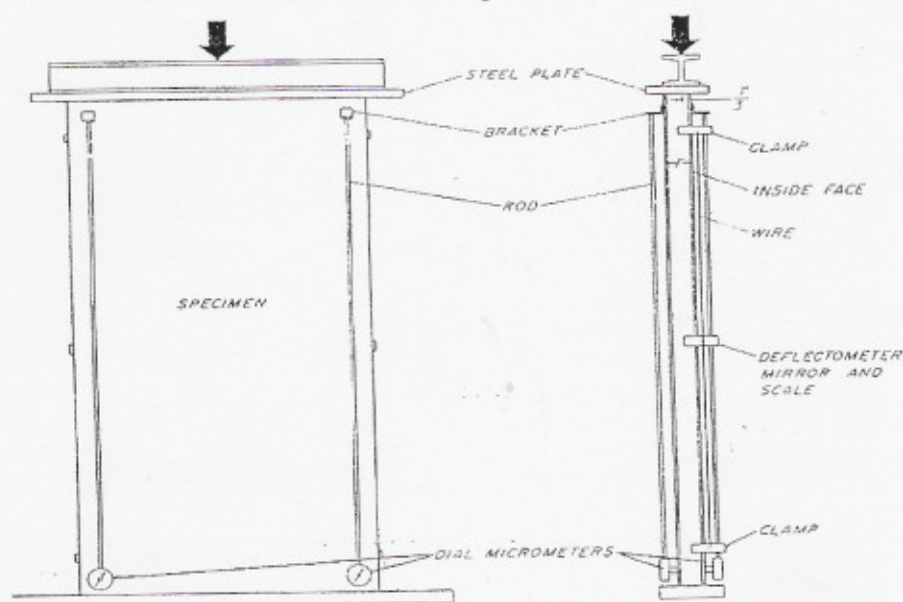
Test Setup for Compressive (Axial) Loading (from "ASTM E72-98, Fig. 2")
